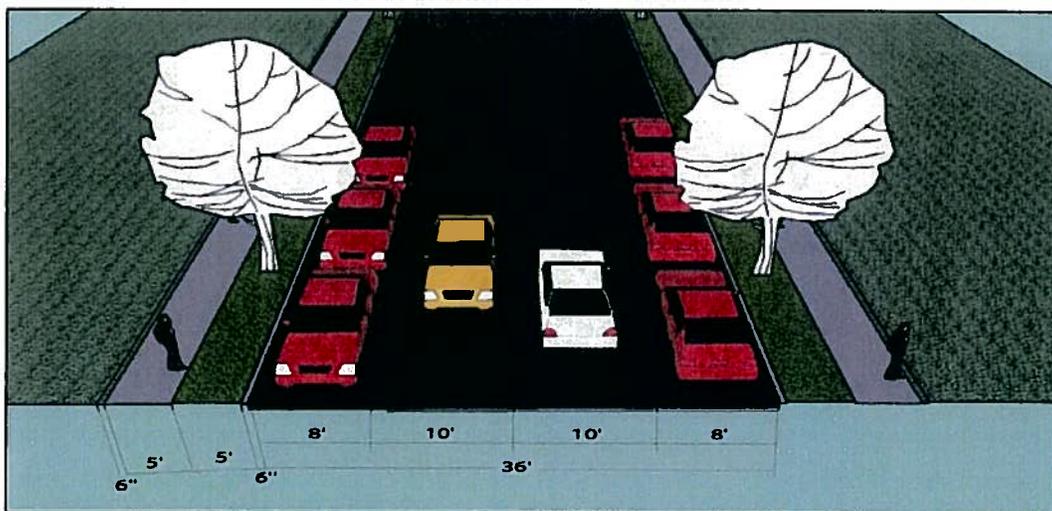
Wide street section with two 10' travel lanes and two 8' lanes of on-street parking. Landscape strips and sidewalks measuring 5' each on both sides of the street.
